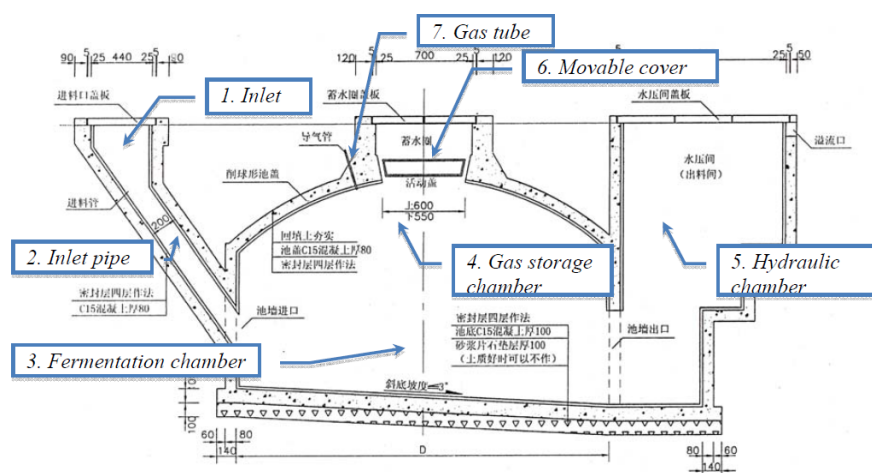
Typical design of a household biogas digester installed under the proposed PoA.
